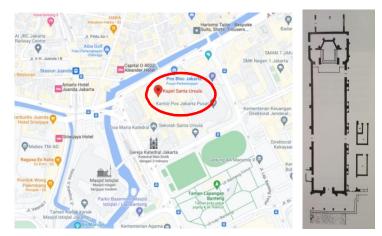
Site Plan & Layout - Santa Ursula Chapel
